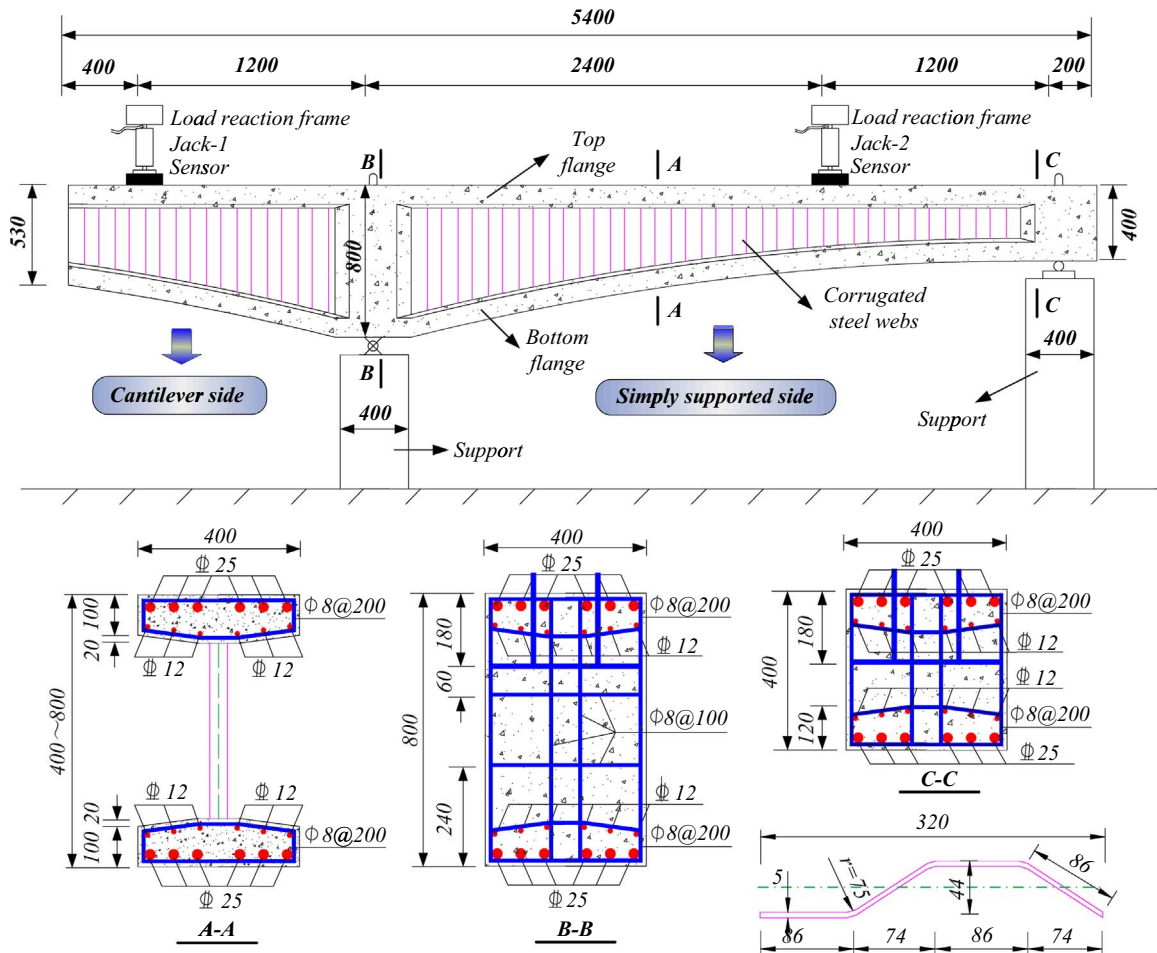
Dimension and reinforcement of the I-girder with CSWs (unit: mm).
